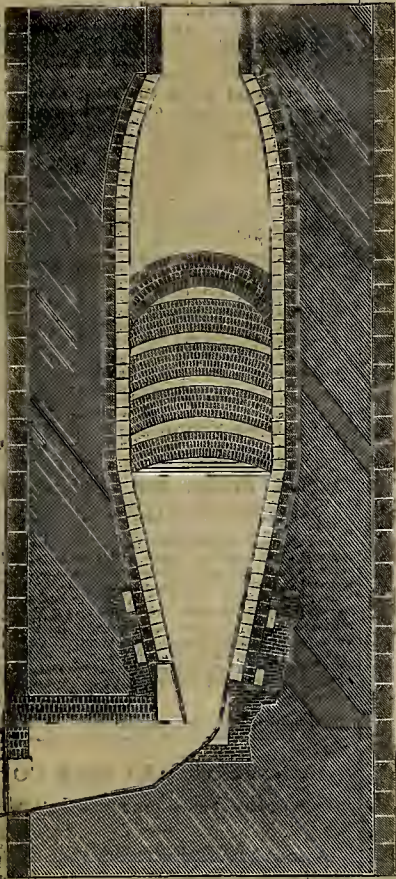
Cross Section of furnace, Walls and Vapor Way Arches.
